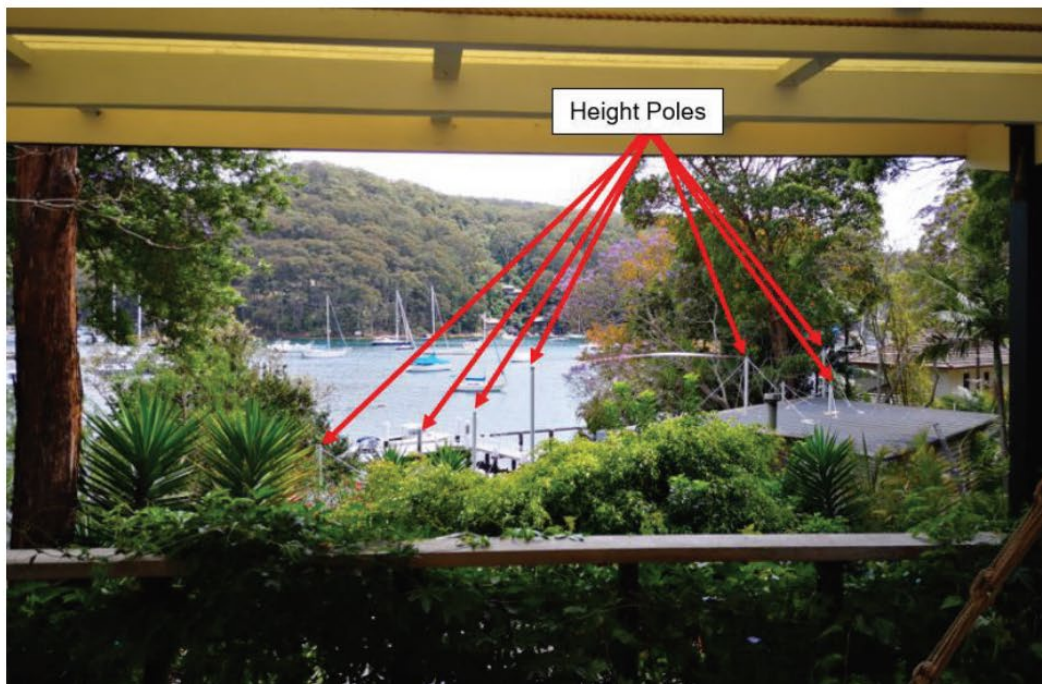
Existing views from No.34 Sturdee Lane to the north (elevated ground floor floor balcony and
